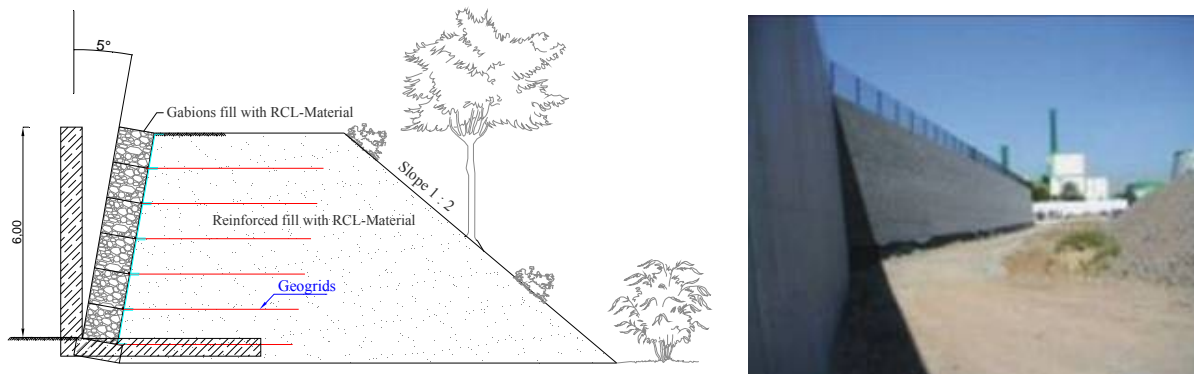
Cross section of constructed geogrid reinforced structure and picture
